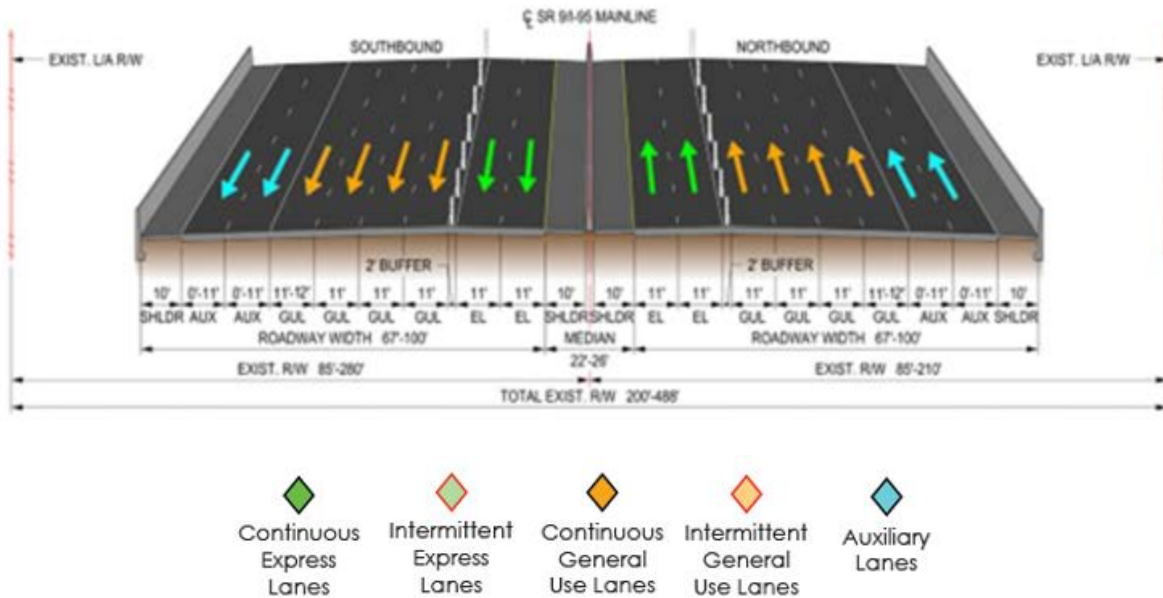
5: Proposed Typical Section - Alternative 1 – CR 854/Ives Dairy Road
